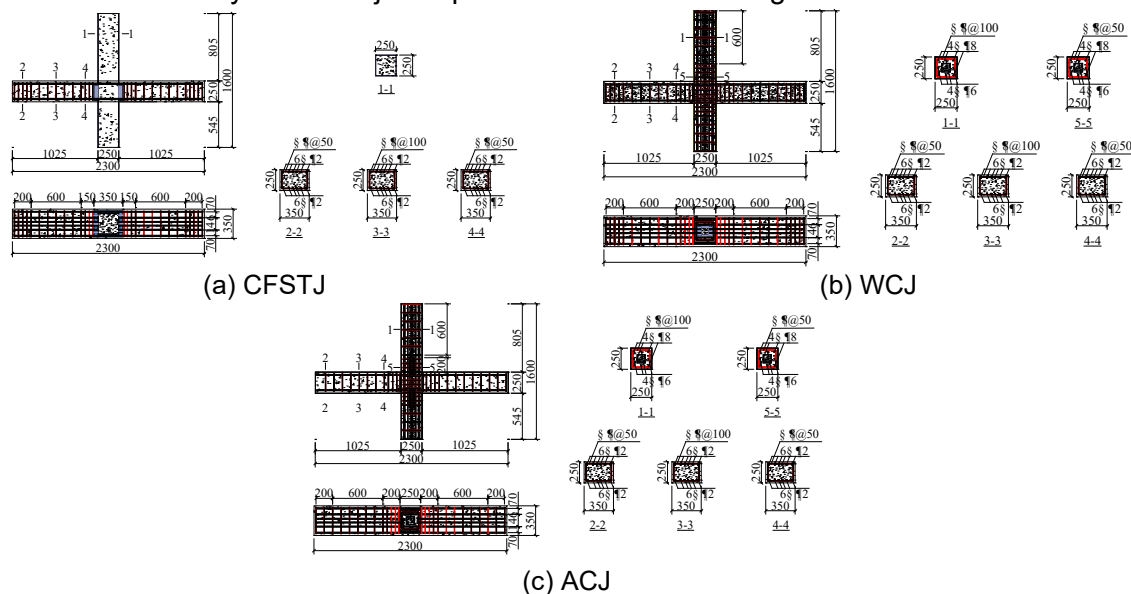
Joint Dimensions and Reinforcement Illustration (Unit: mm)
